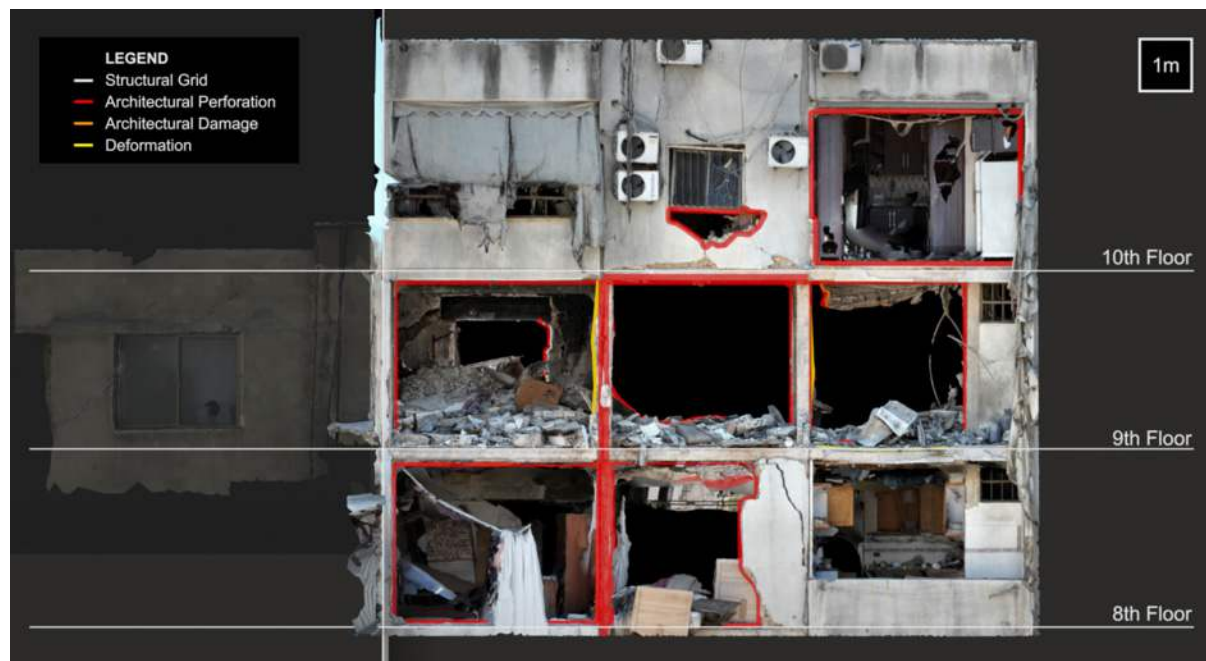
North elevation of the photogrammetry model showing damage sustained to the north façade of the Cherri building.
